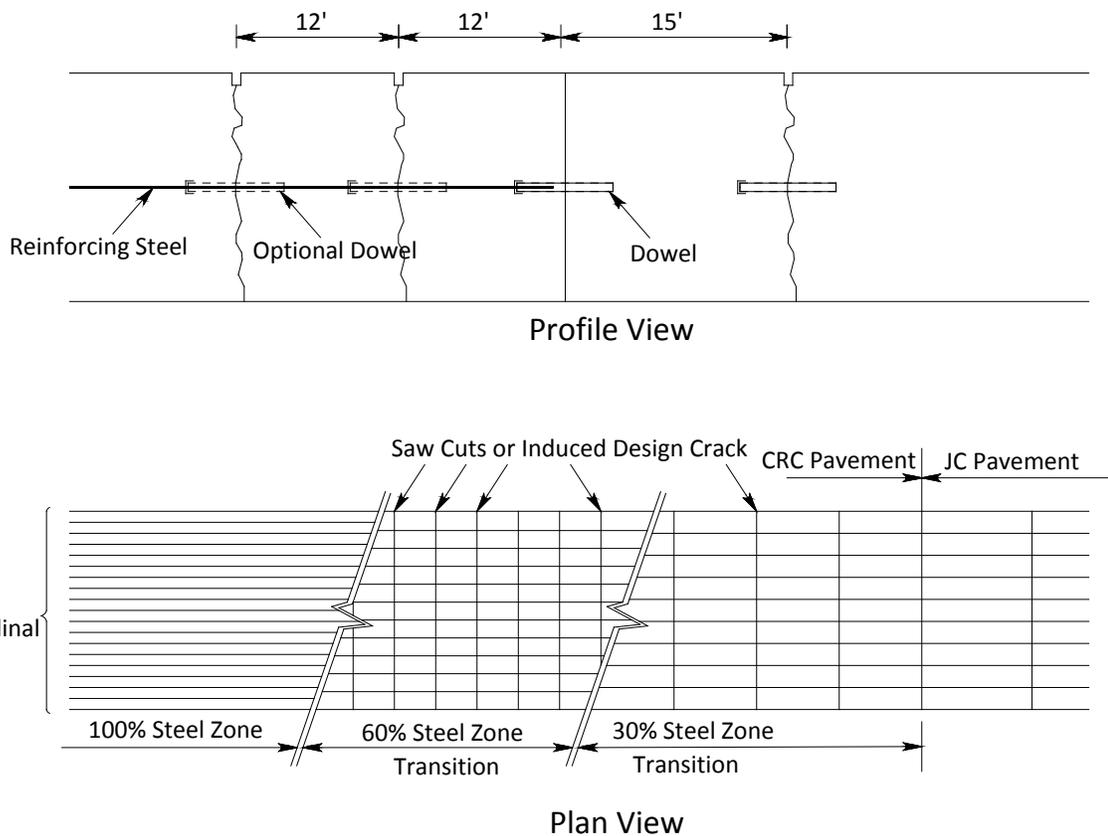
Continuously reinforced to jointed pavement. (Jung et al. 2007)
